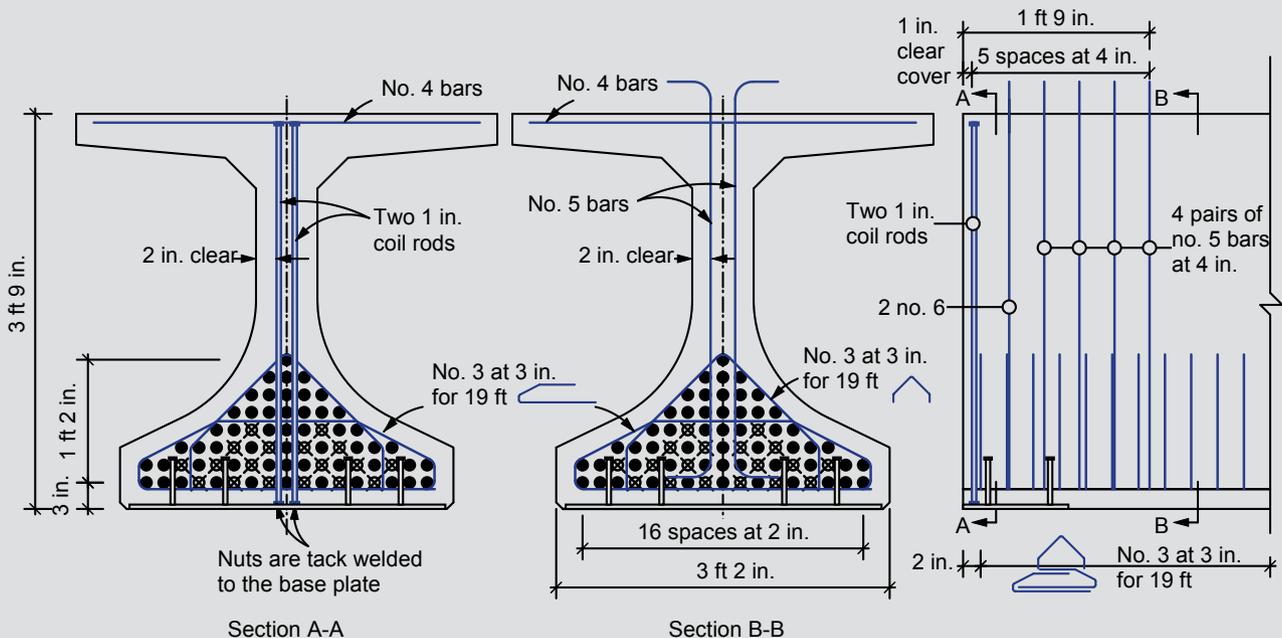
Web end reinforcement details of example 1 using the proposed requirements. Note: no. 3 = 10M; no. 4 = 13M; no. 5 = 16M; no. 6 = 19M; 1 in. = 25.4 mm; 1 ft = 0.305 m.
